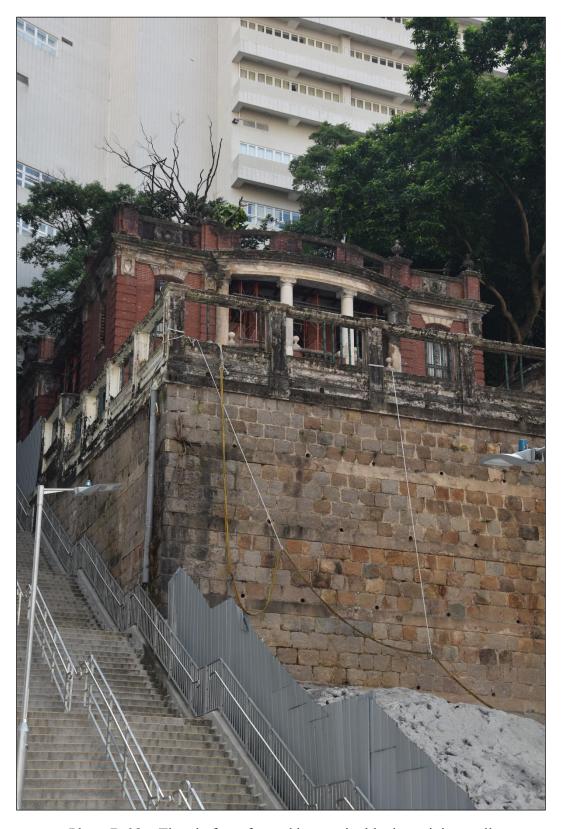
The platform formed by granite block retaining wall at the north-west (front) side and south-east (Ship Street) side, (8th October, 2024)
